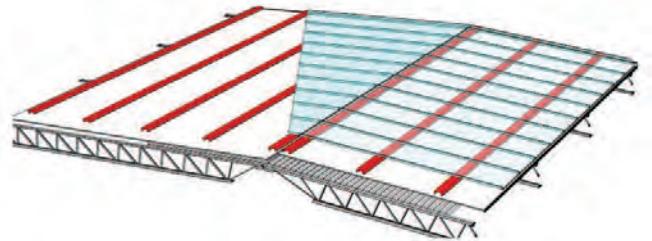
Metal-over-Sloped Roof System (Bar Joist Shown)
